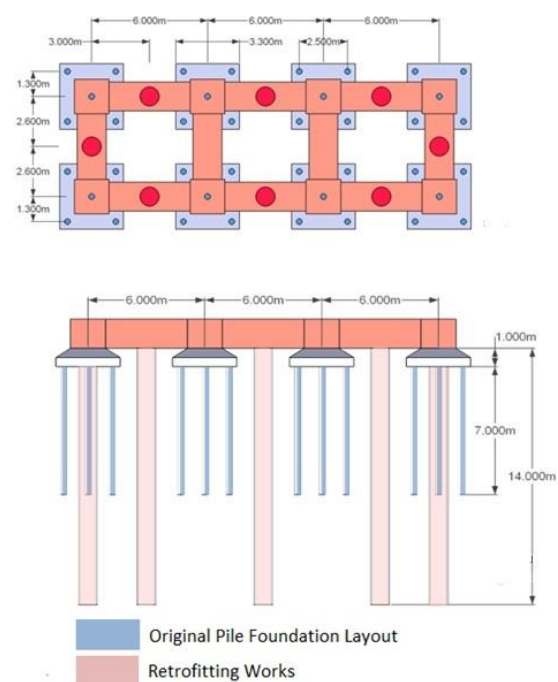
Plan and elevation of viaduct "B" [1]-[4]
